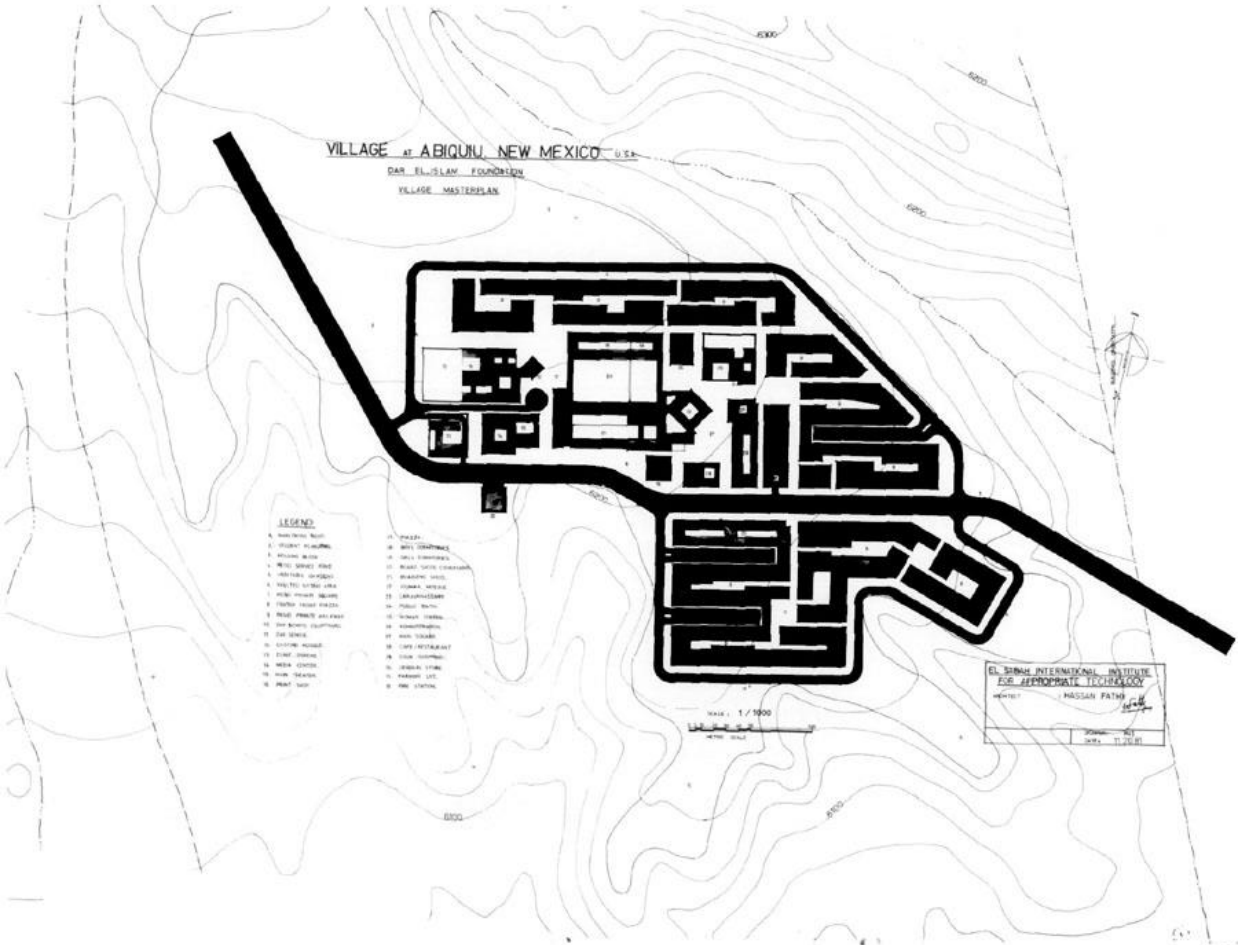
Site plan Dar al-Islam Abiquiu, United States
